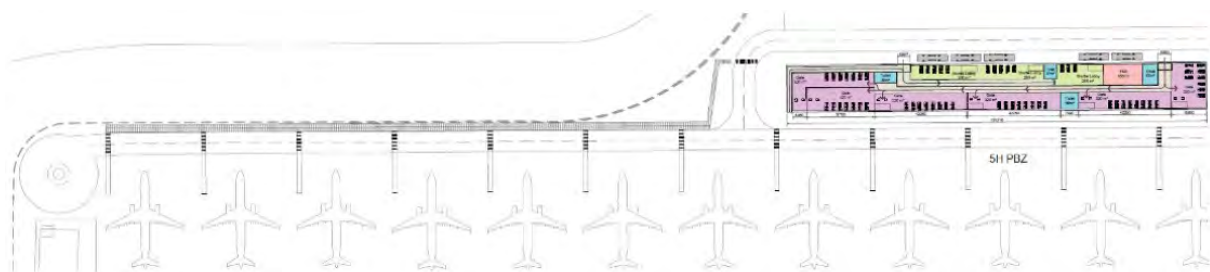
Plan view of PBZ ground floor and protected walkway along apron 5H
